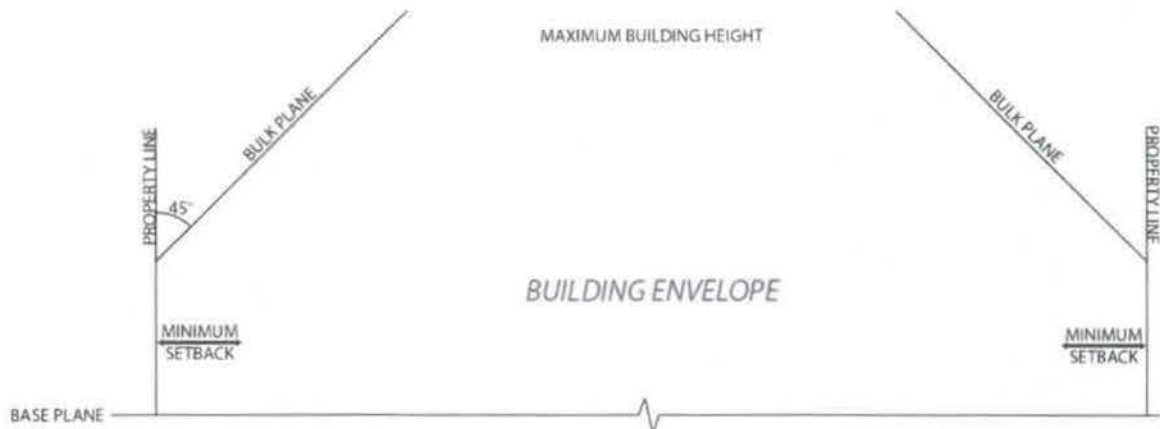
Section view of bulk plane building envelope, as measured from all property lines.
